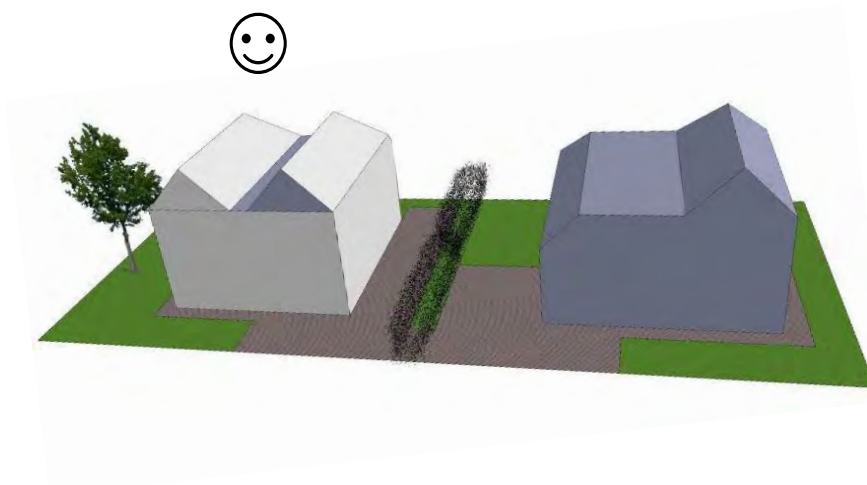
New dwellings should not be located in front of an existing house on a front site. Where site depth exceeds width, new dwellings only need to comply with 2GP standards.
